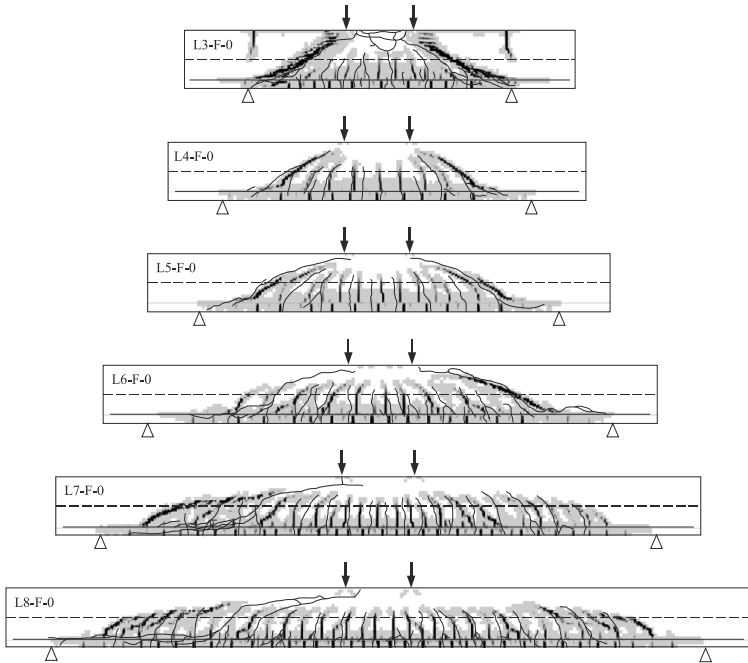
Crack pattern of beams L3 to L8 modelled with the fixed crack model
